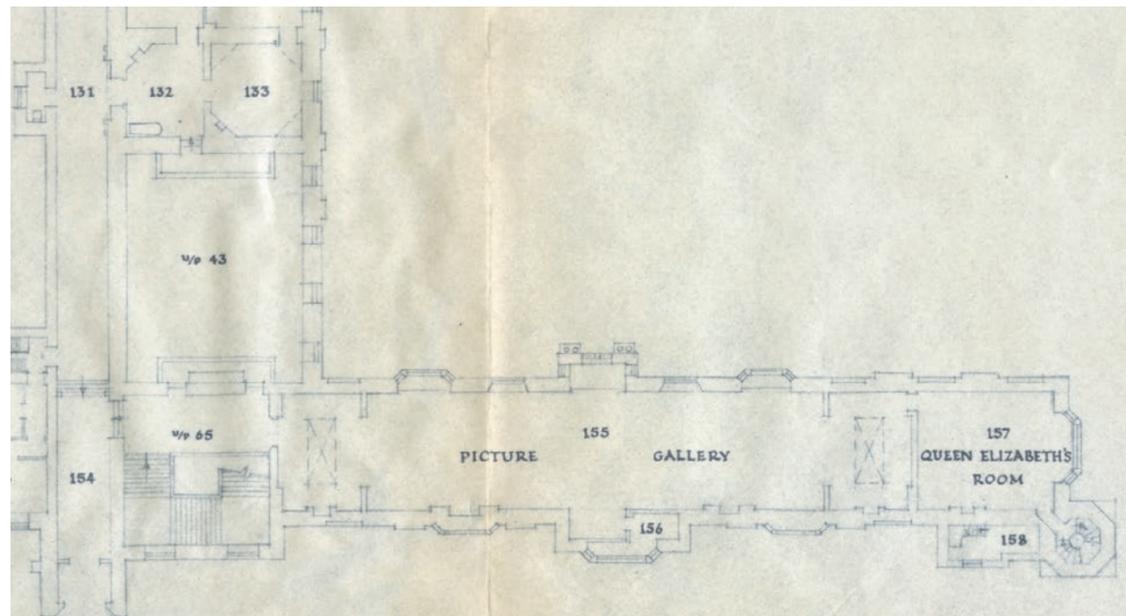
/ Cobham Hall, plan of first floor (drawn ca. 1957/1958): detail of north wing, with part of central block.
